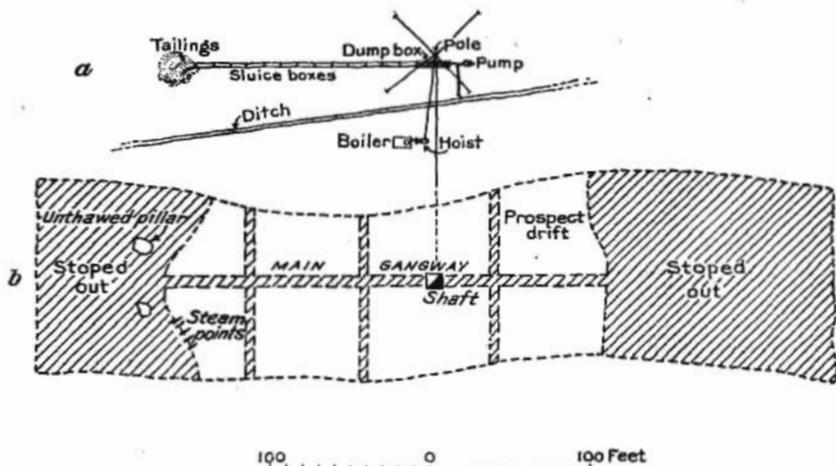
Diagram showing arrangement of a drift mine. *a*, Plan on surface; *b*, plan on bedrock.
